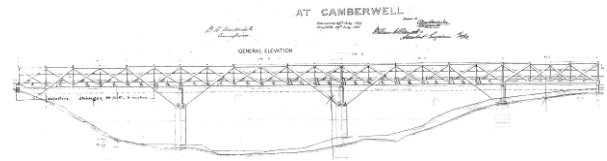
Bennett's Falbrook Bridge, 1858 (68½')
